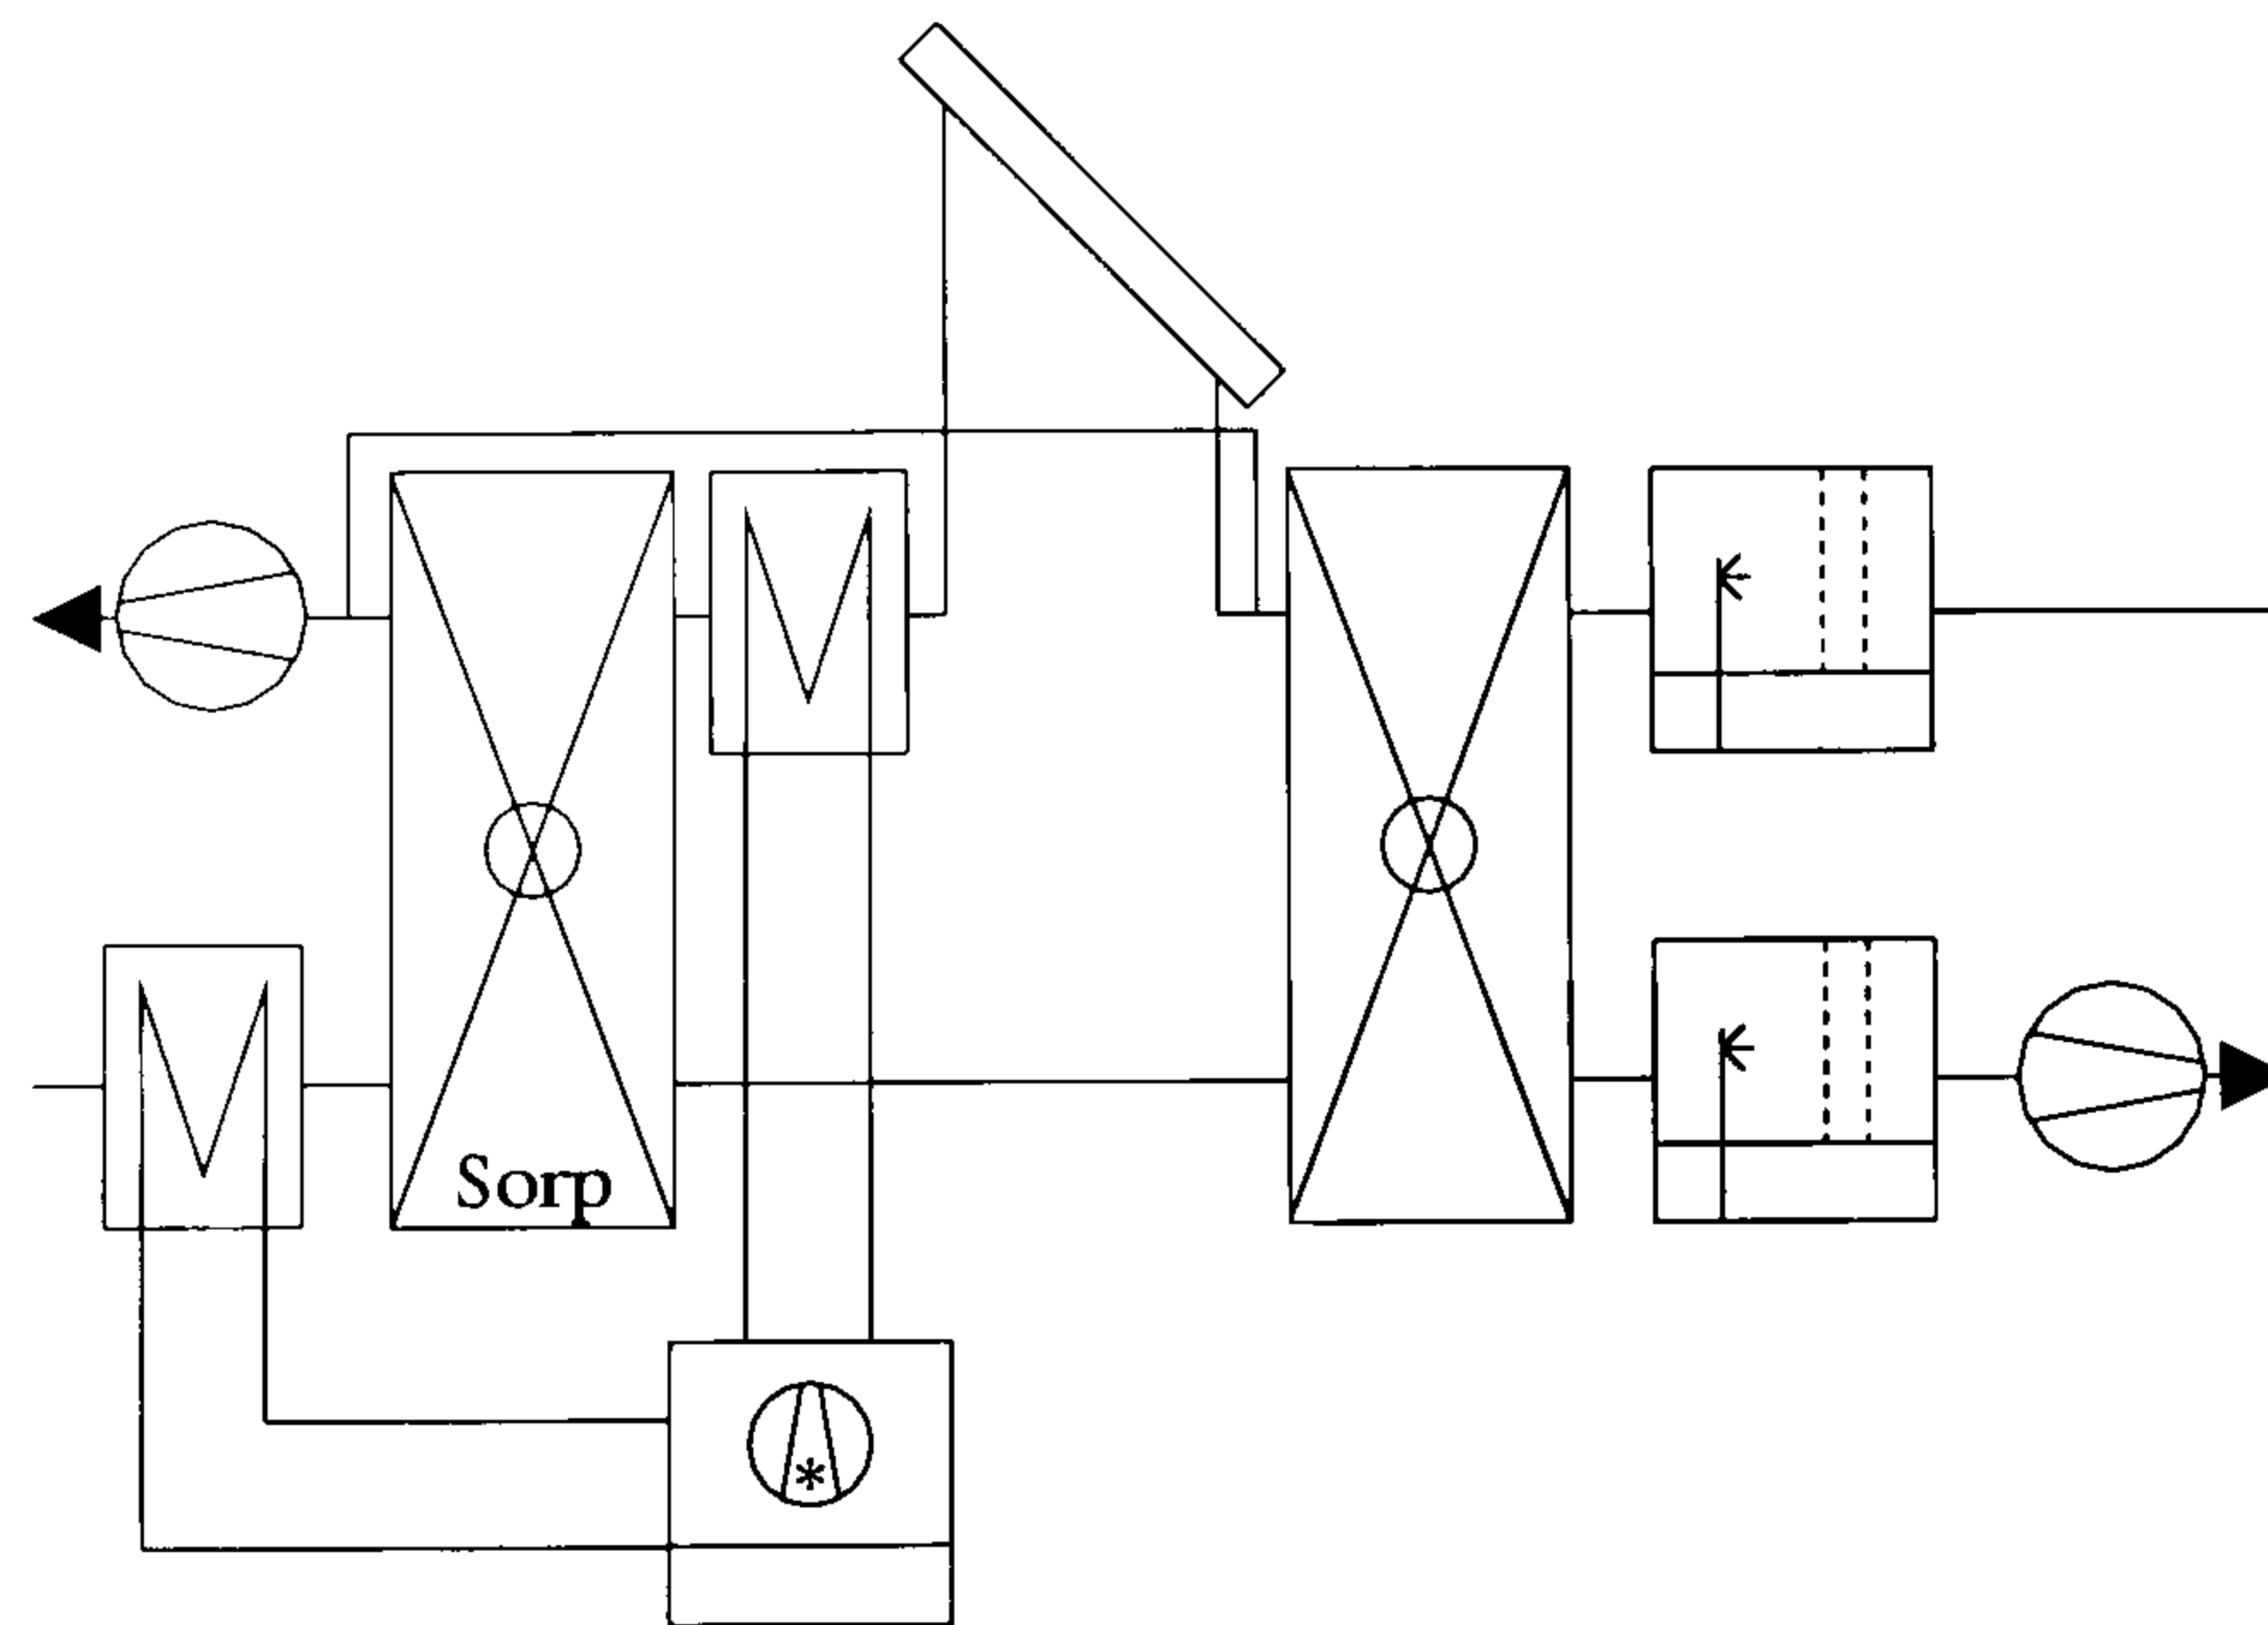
Solar assisted desiccant cooling system with a compression chiller (Surface cooler in front of the dehumidifier to achieve deep dehumidification)
